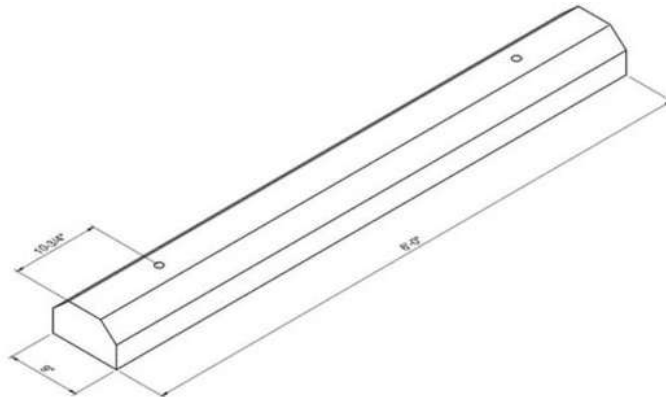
(ii): Example of a standard wheel stop or parking block.
